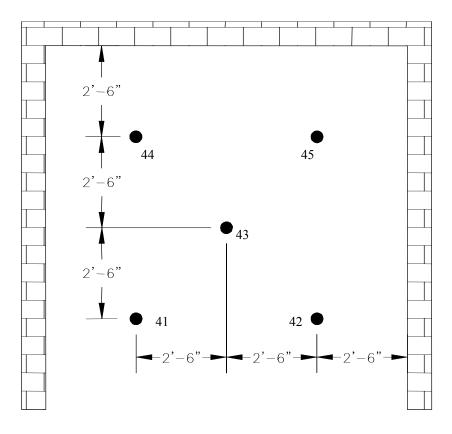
Instrumentation Arrangement (Burn Room Ceiling).
